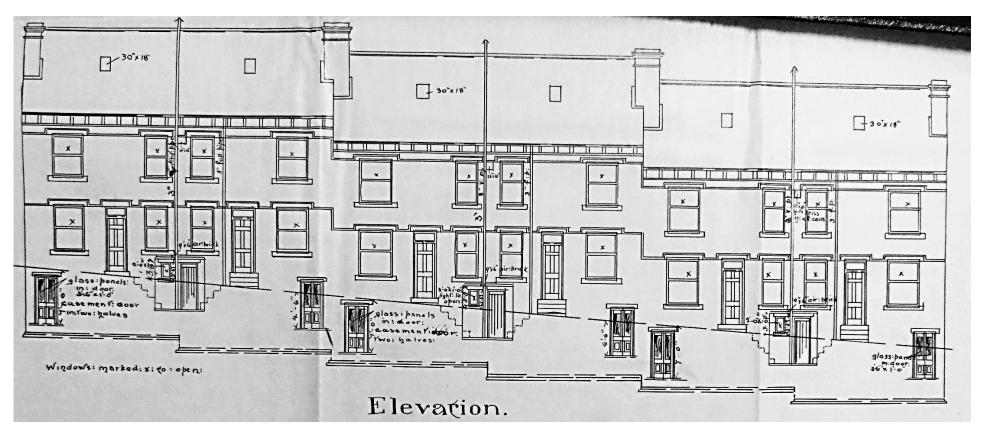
Elevation of the houses shows important notes about skylights, windows and doors (Carby Hall 1897a).
